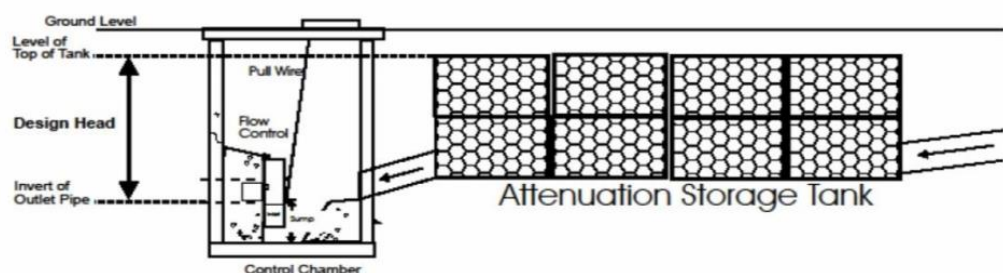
TYPICAL ATTENUATION STORAGE TANK DETAIL
